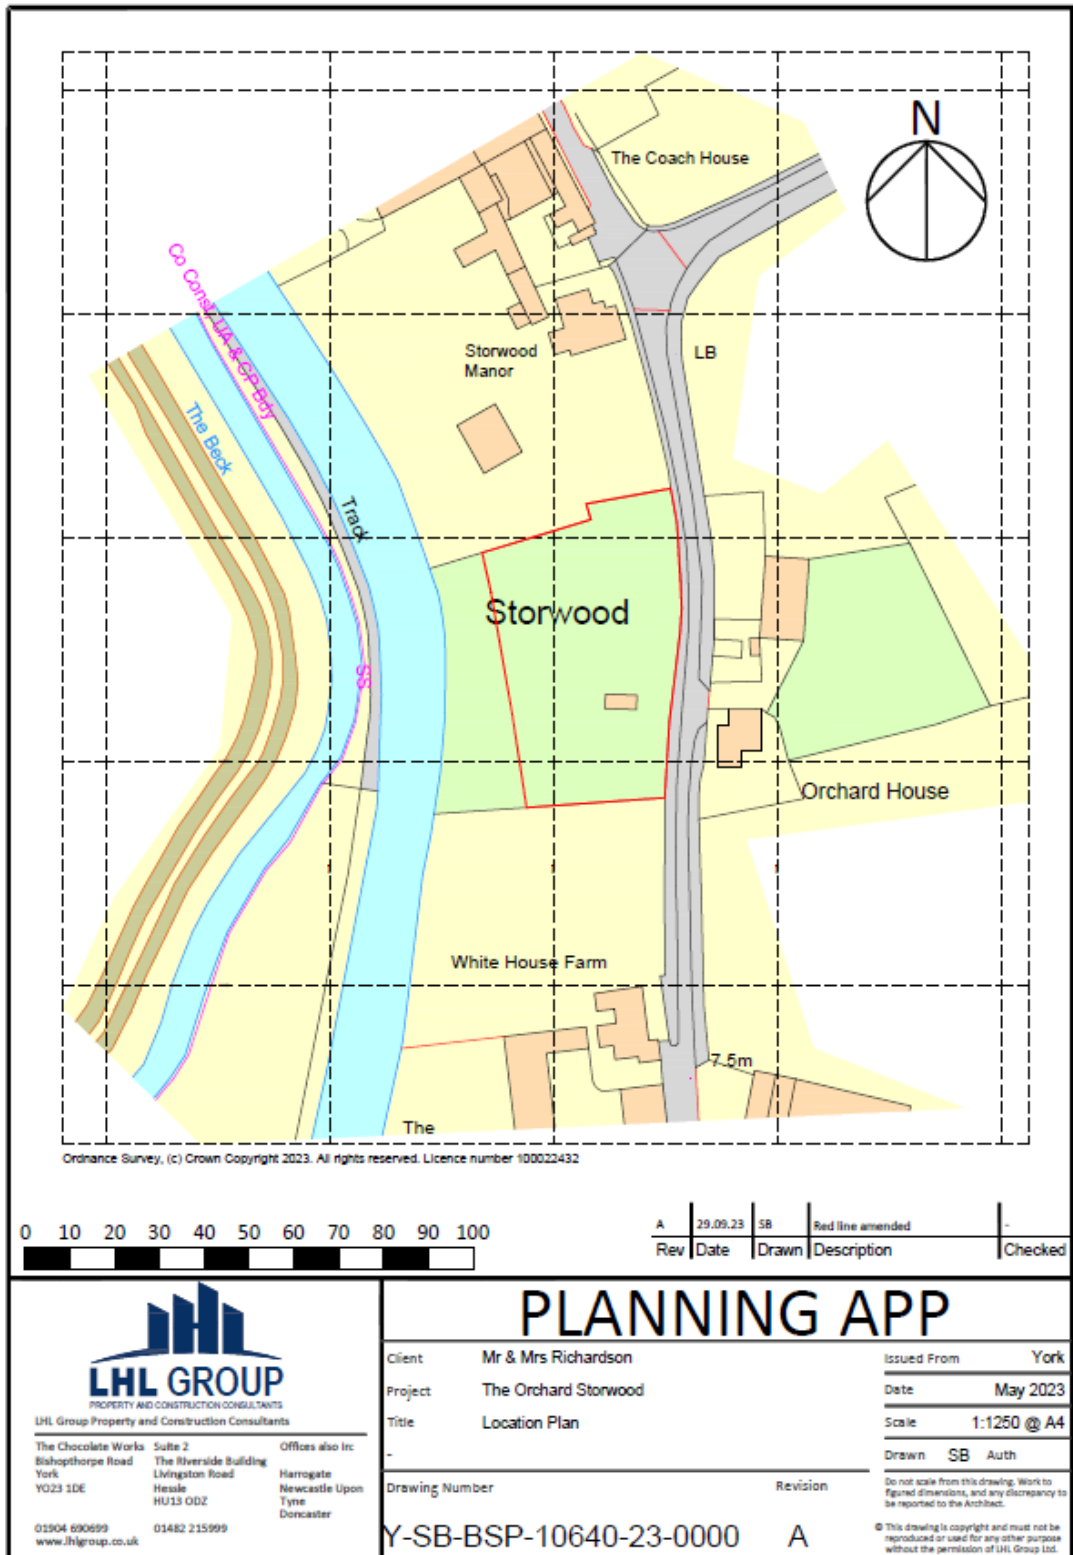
Site plan as existing with red line showing area subject to planning permission.
